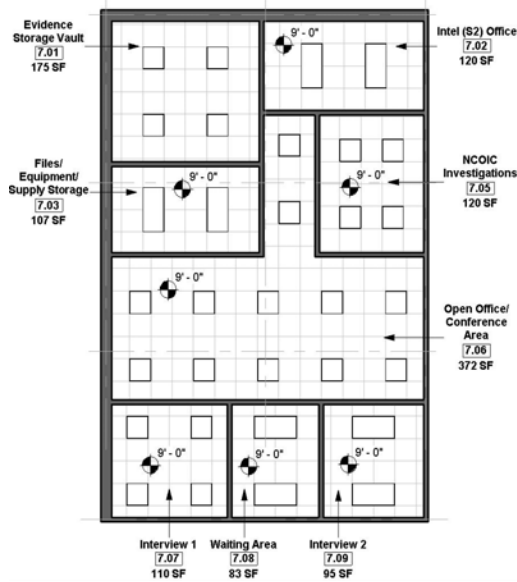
Module 7: Investigation/ S2 – Reflected Ceiling Plan
